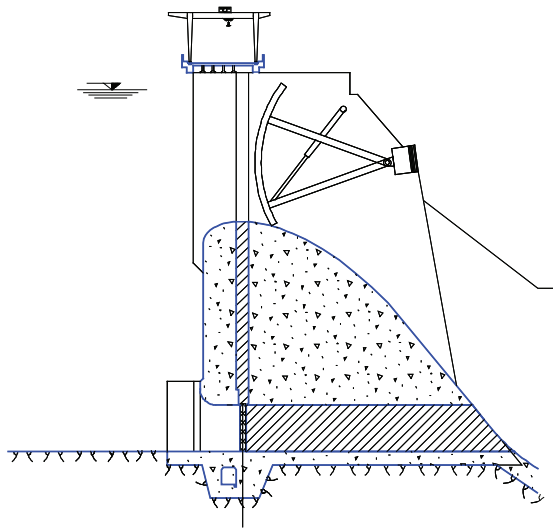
Typical cross-section of a gated surface spillway with a high ogee crest.
